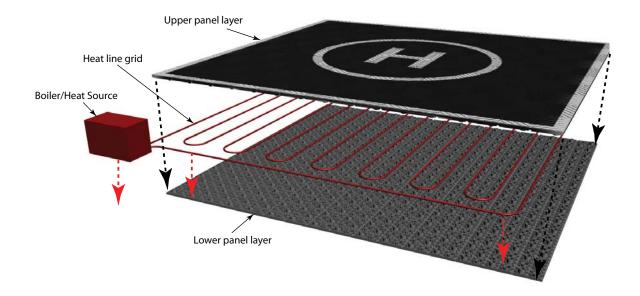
Radiant Heat Option - this exploded view of the upper and lower panel assemblies shows how the heating lines are sandwiched between them. The boiler location is for illustration only - it could be placed in any appropriate spot and be of a hot water or steam type. Heating line spacing could be 8" or 16". Lines outside the pad would be insulated.
